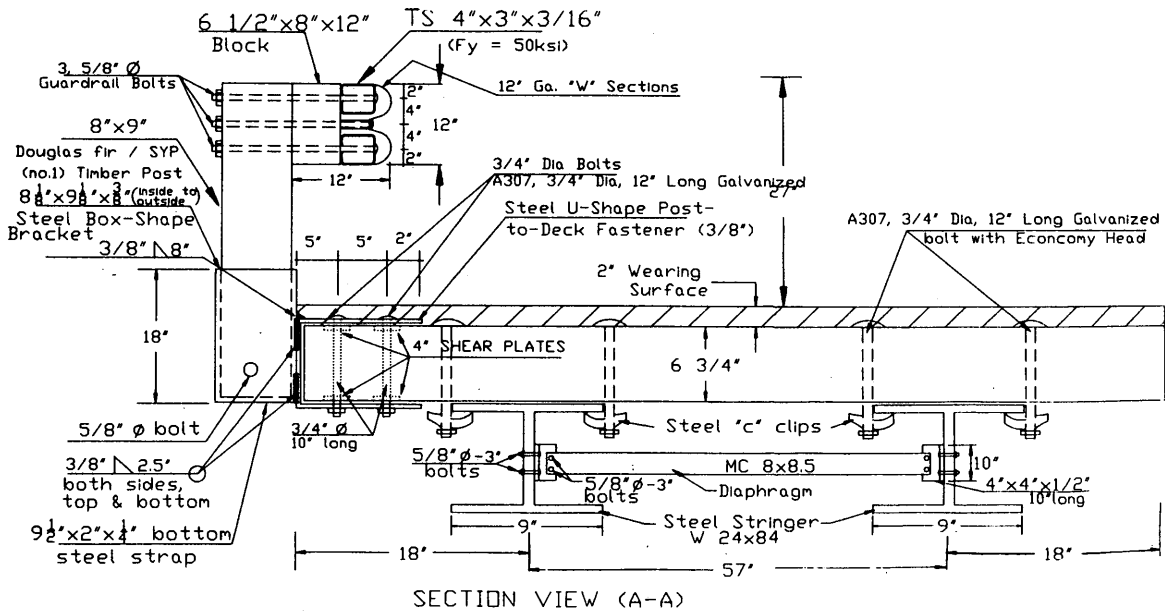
Timber Bridge Rail System for PL-1: cross-sectional details of bridge rail.
